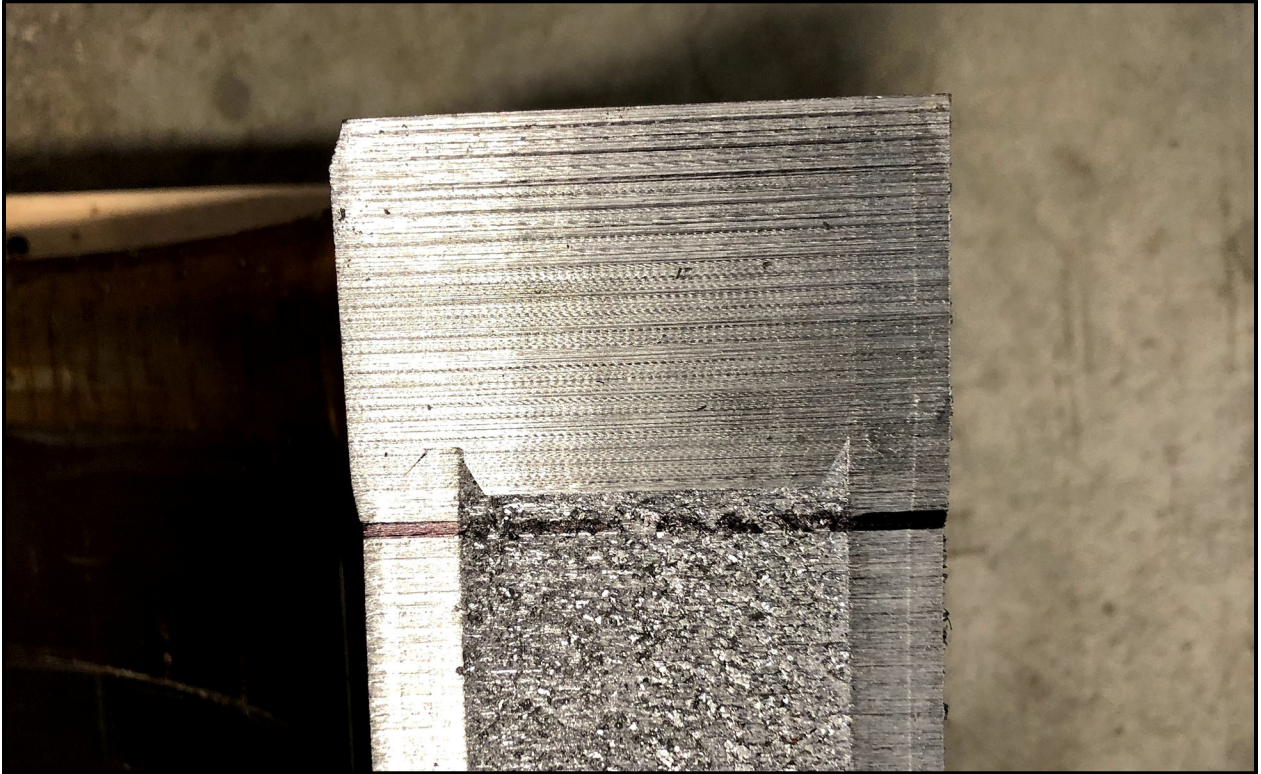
SC-55G2 18TU-10 Destructive Disassembly Cut AM/AN at Upper Flange
